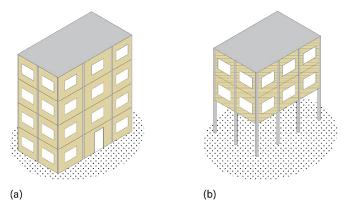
In building (a) exterior and interior infill and partition walls are on every floor, but in (b) these walls are absent in the ground floor. The ground floor is open.
